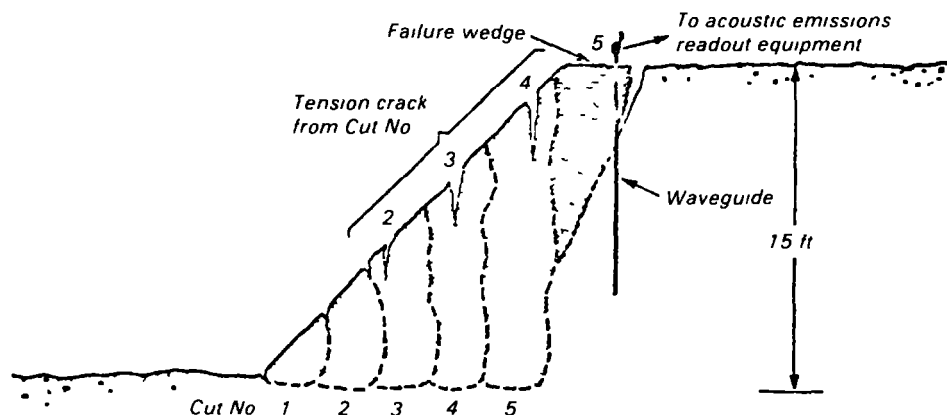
Schematic diagram of embankment purposely brought to failure by successive excavation at toe of slope
